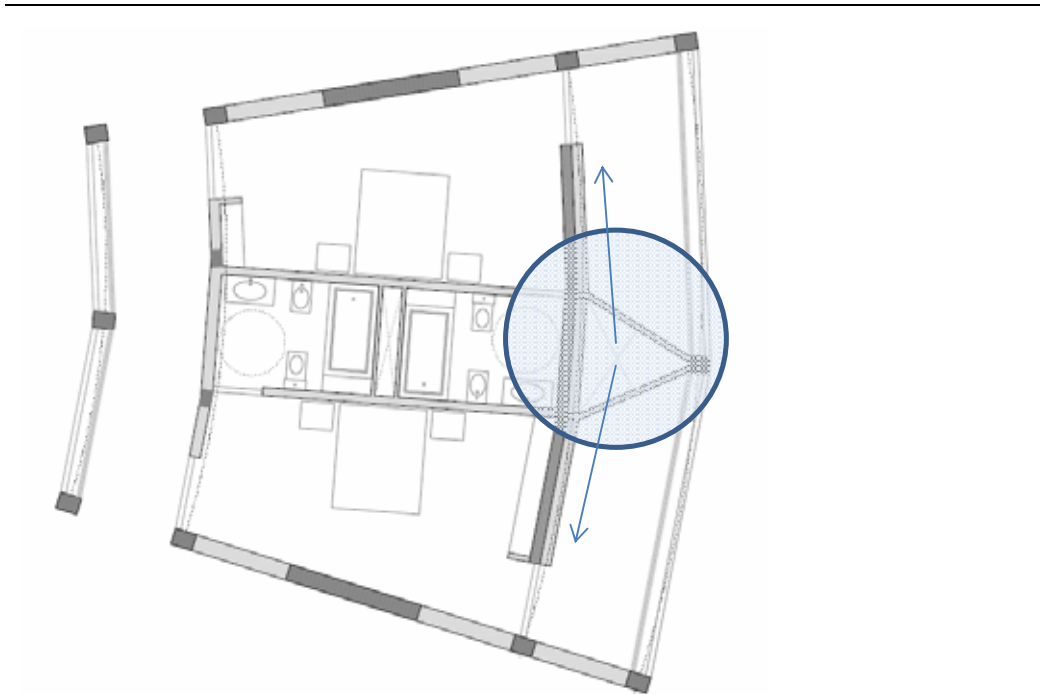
(k) Hotel room floor plan indicating the ventilation courtyard, which provides fresh air in summer, through the basement.
